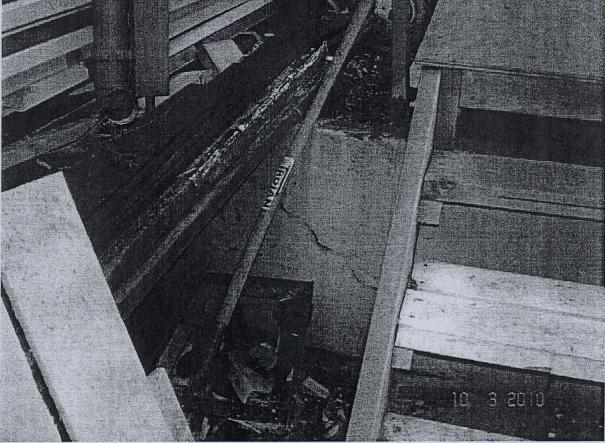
Stepped crack as previous - courtyard undergoing renovations.
